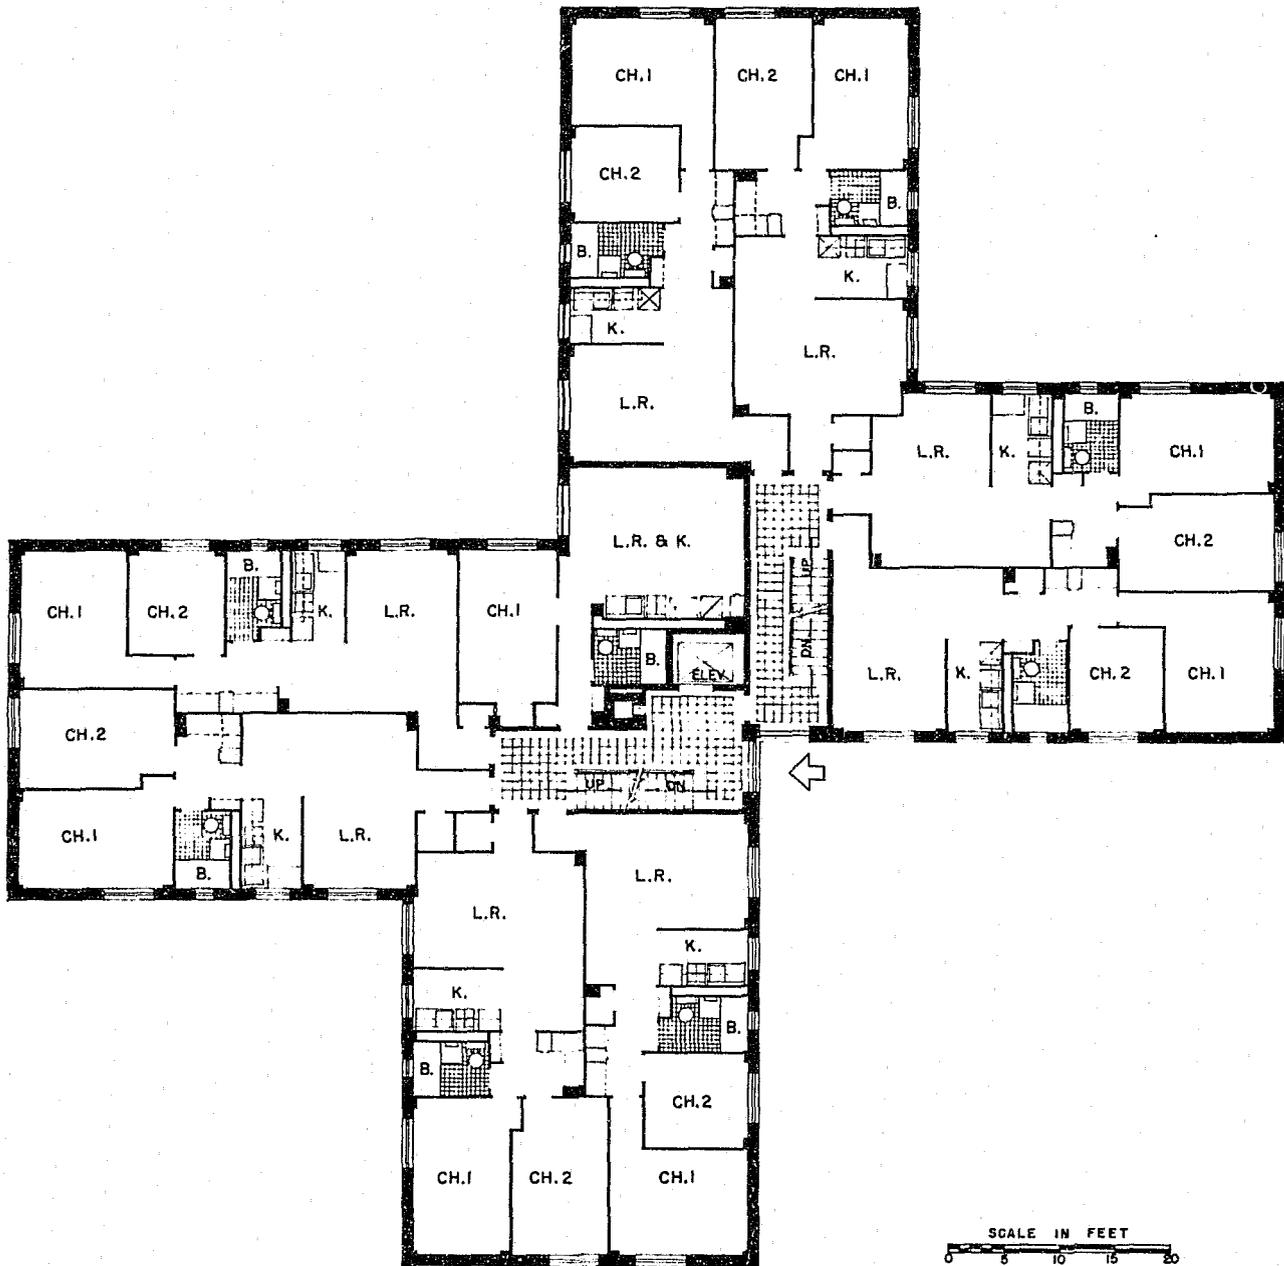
Brownsville Homes, New York. Floor plan.
